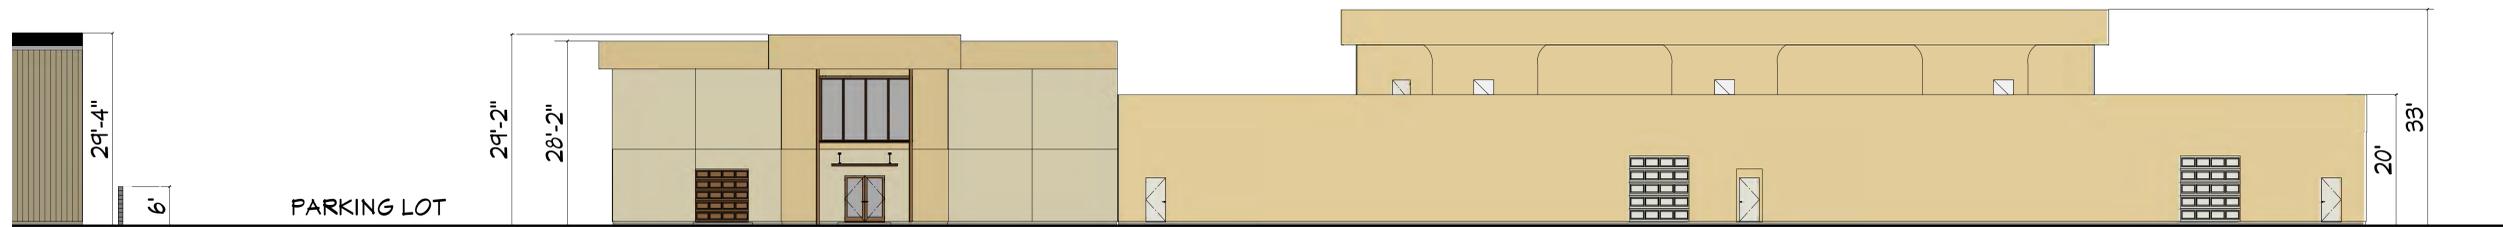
EXHIBIT A SUBJECT LOT AND RIGHT ADJACENT LOT FRONT ELEVATION SCALE=3/32"=1'-0"
